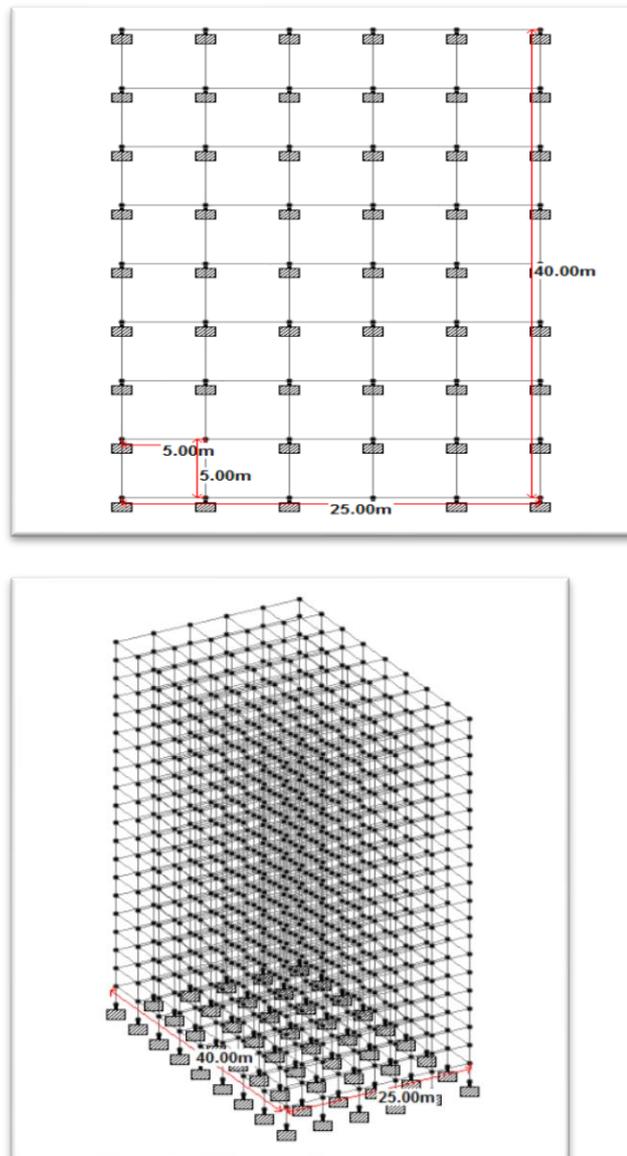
Plan and Isometric view of CaseI
